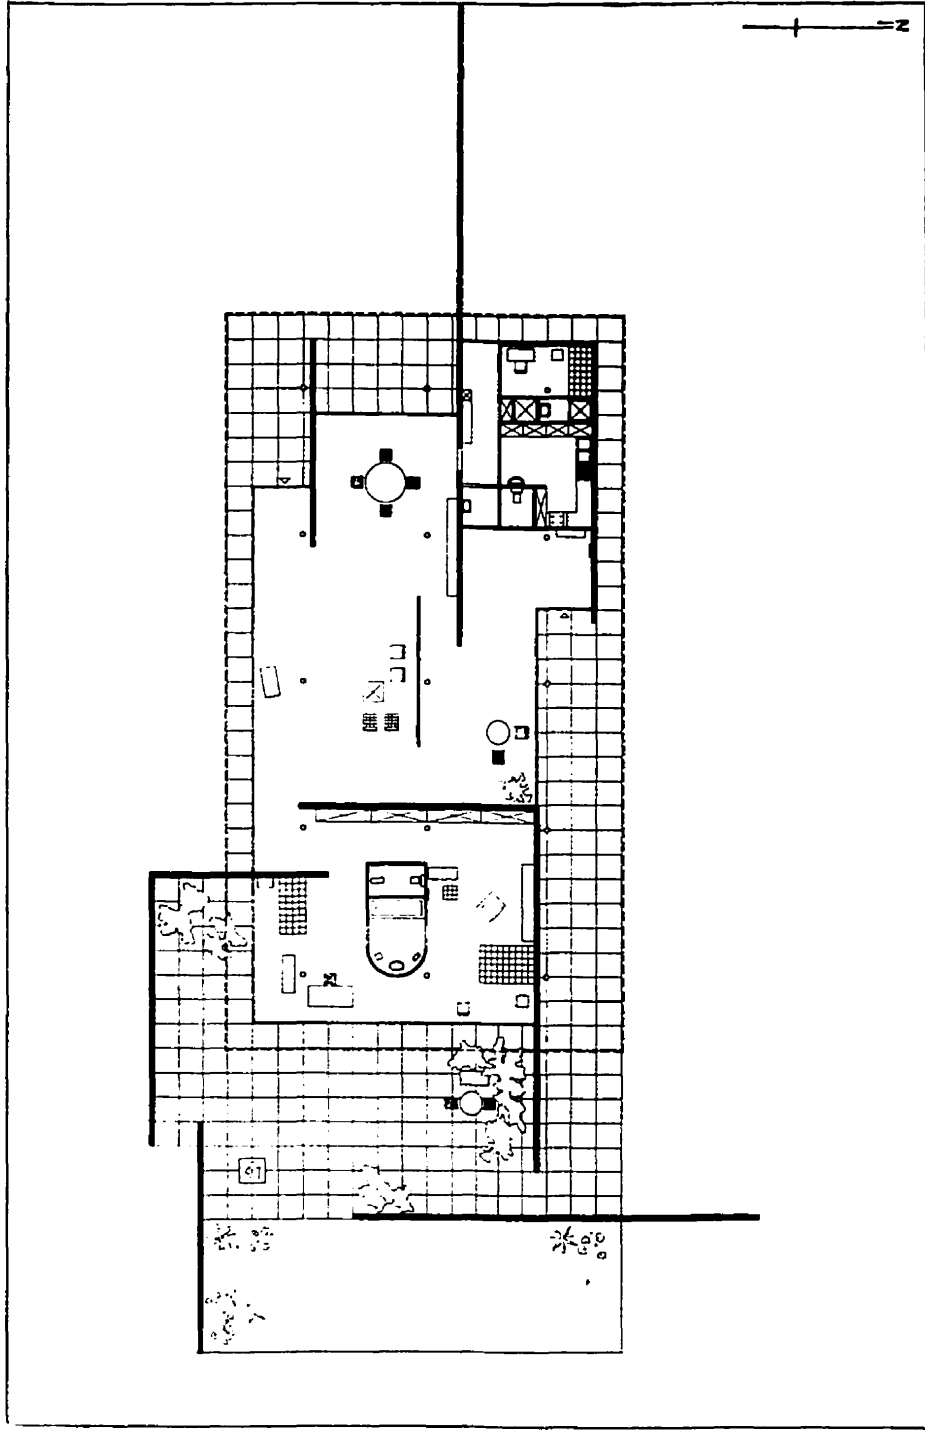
Plan, Model House at Berlin Building Exposition, 1931.
